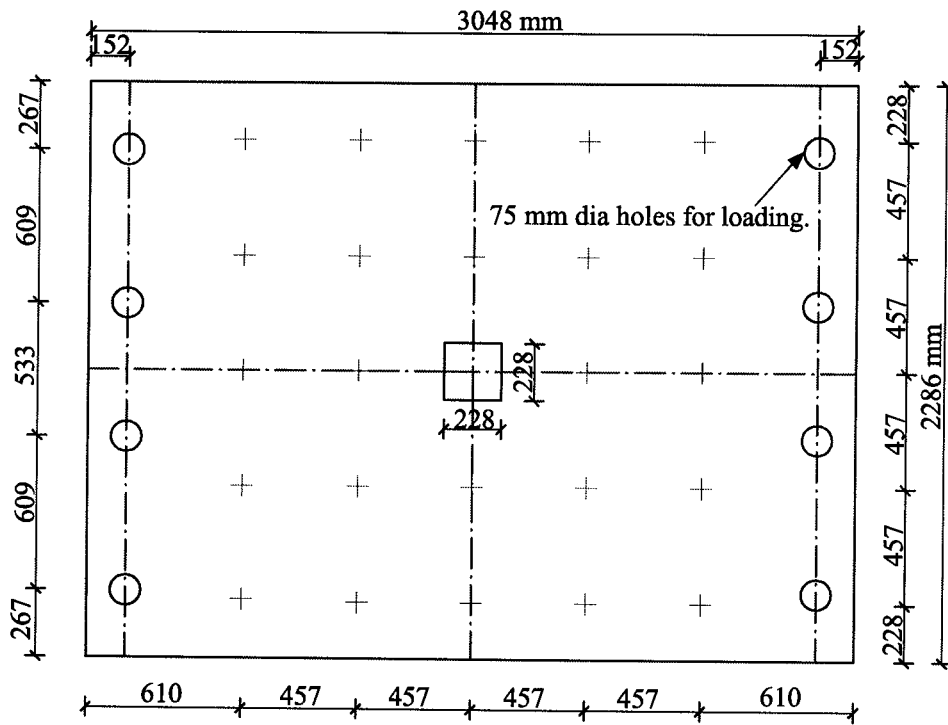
Plan of (Islam and Park (1976)) Test Specimen
